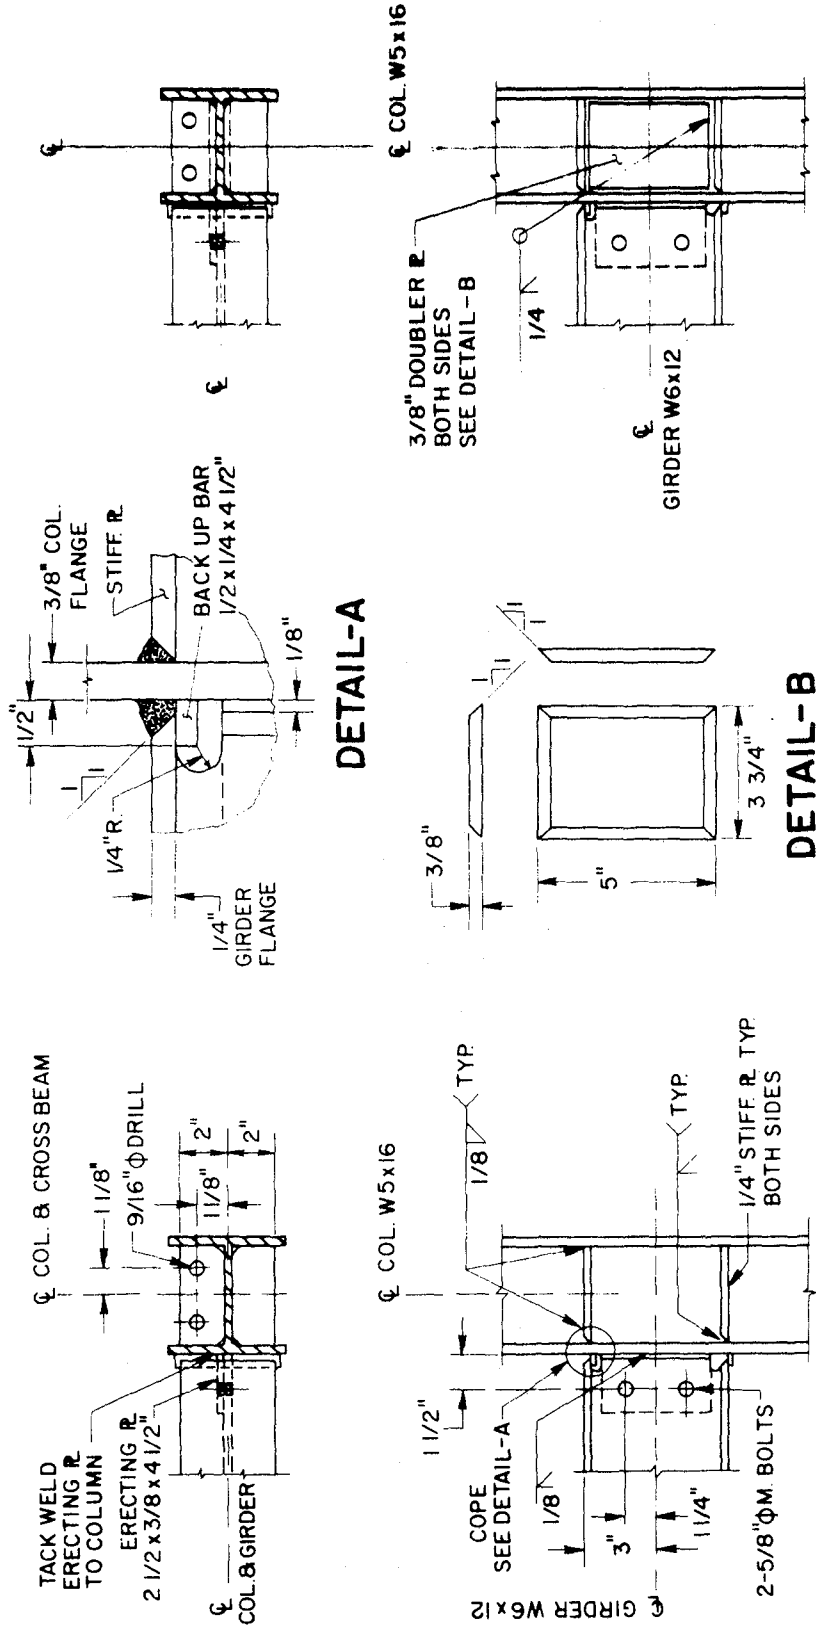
PLAN AND ELEVATIONS OF THE TEST STRUCTURE
